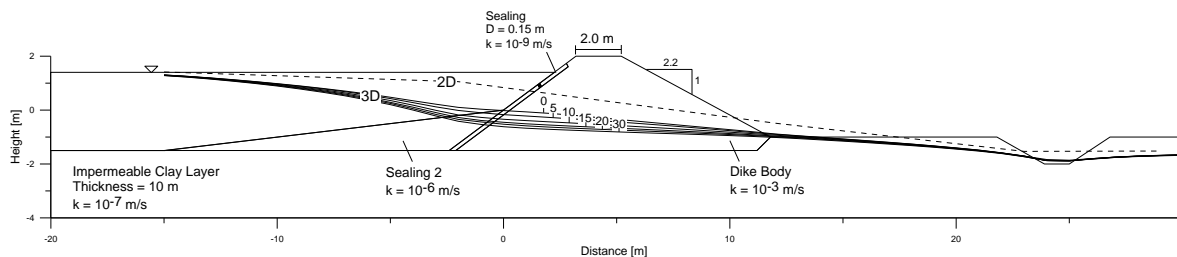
Resulting pore water pressures for the dam case study with a crack in the surface concrete sealing
